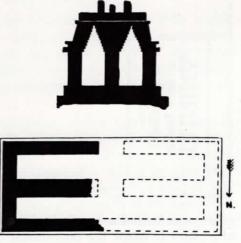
Toniná, Chis. Plan and Section of House B. (Scale 1:200).
